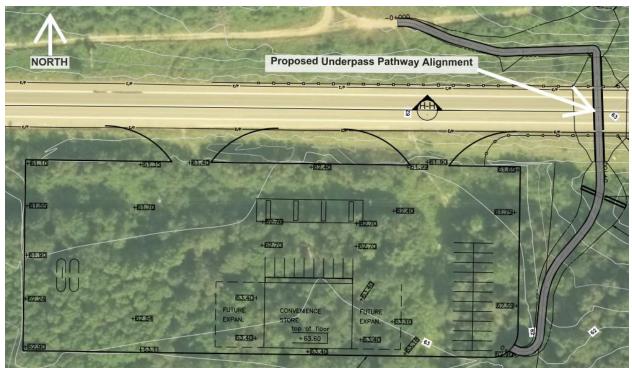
Plan View of Conceptual KFN Underpass Alignment
